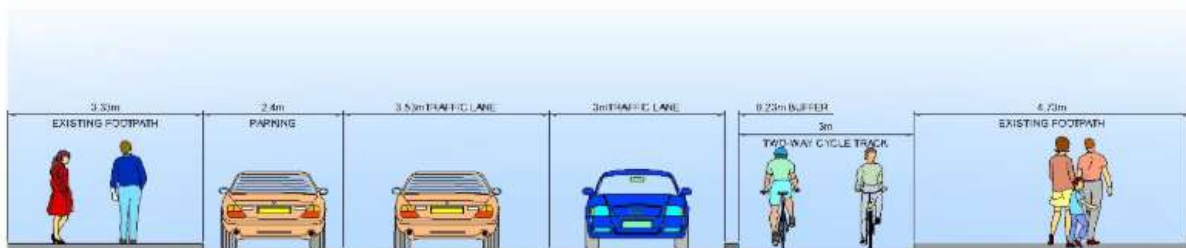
Option 1 Cross Section at Seapoint Promenade – one way traffic
